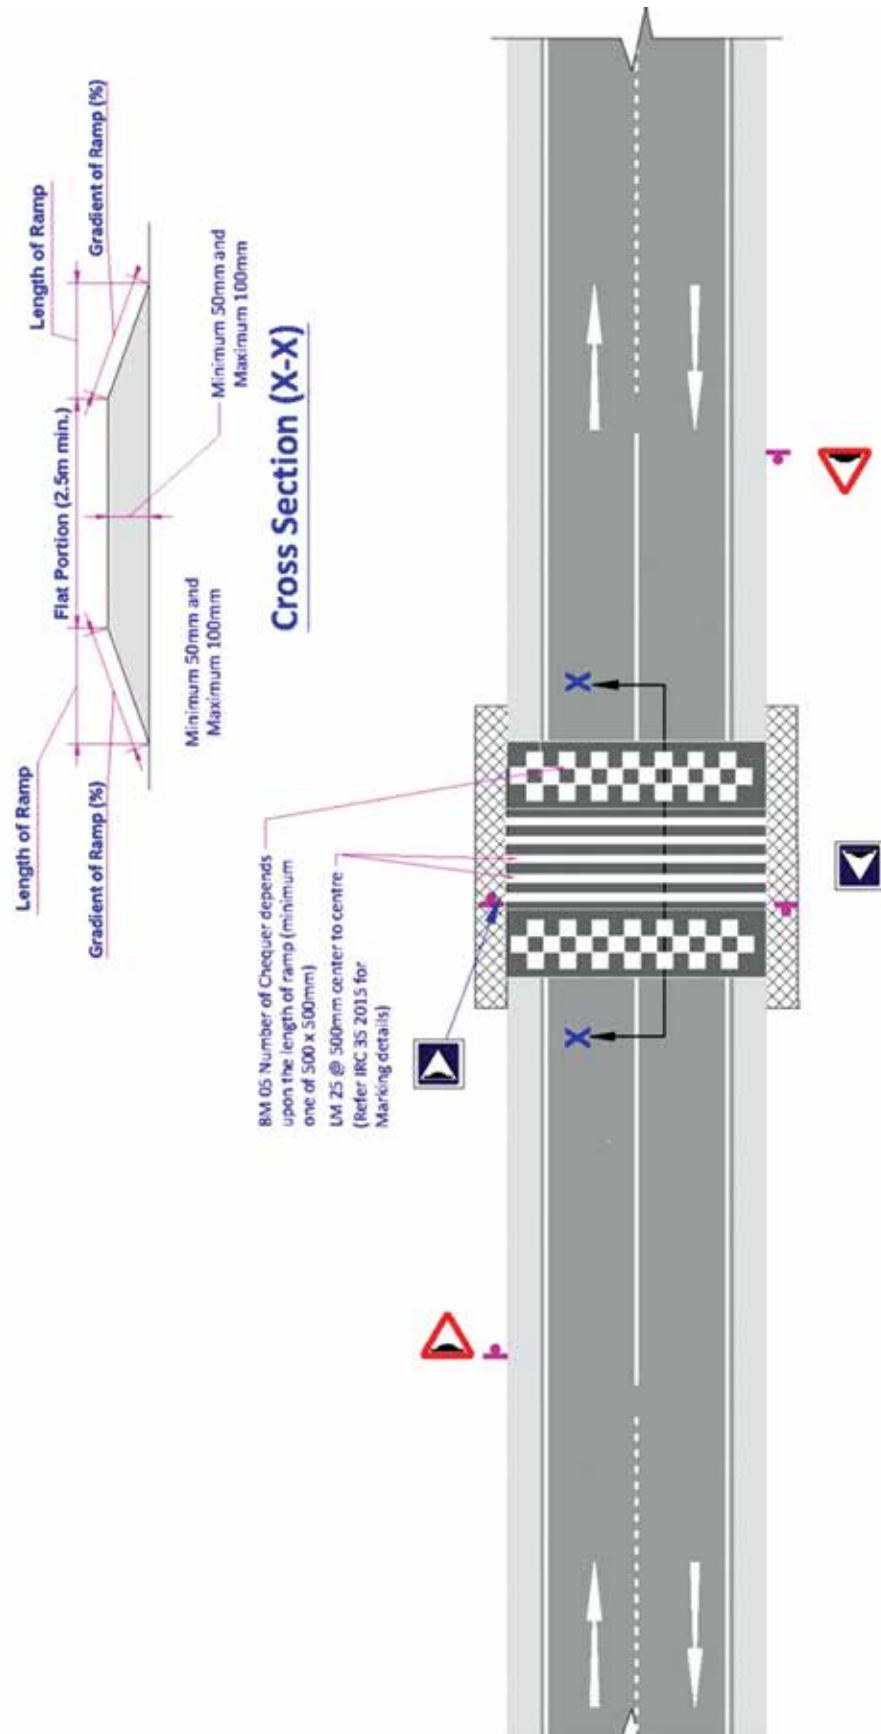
Geometric Details of Trapezoidal Road Hump
